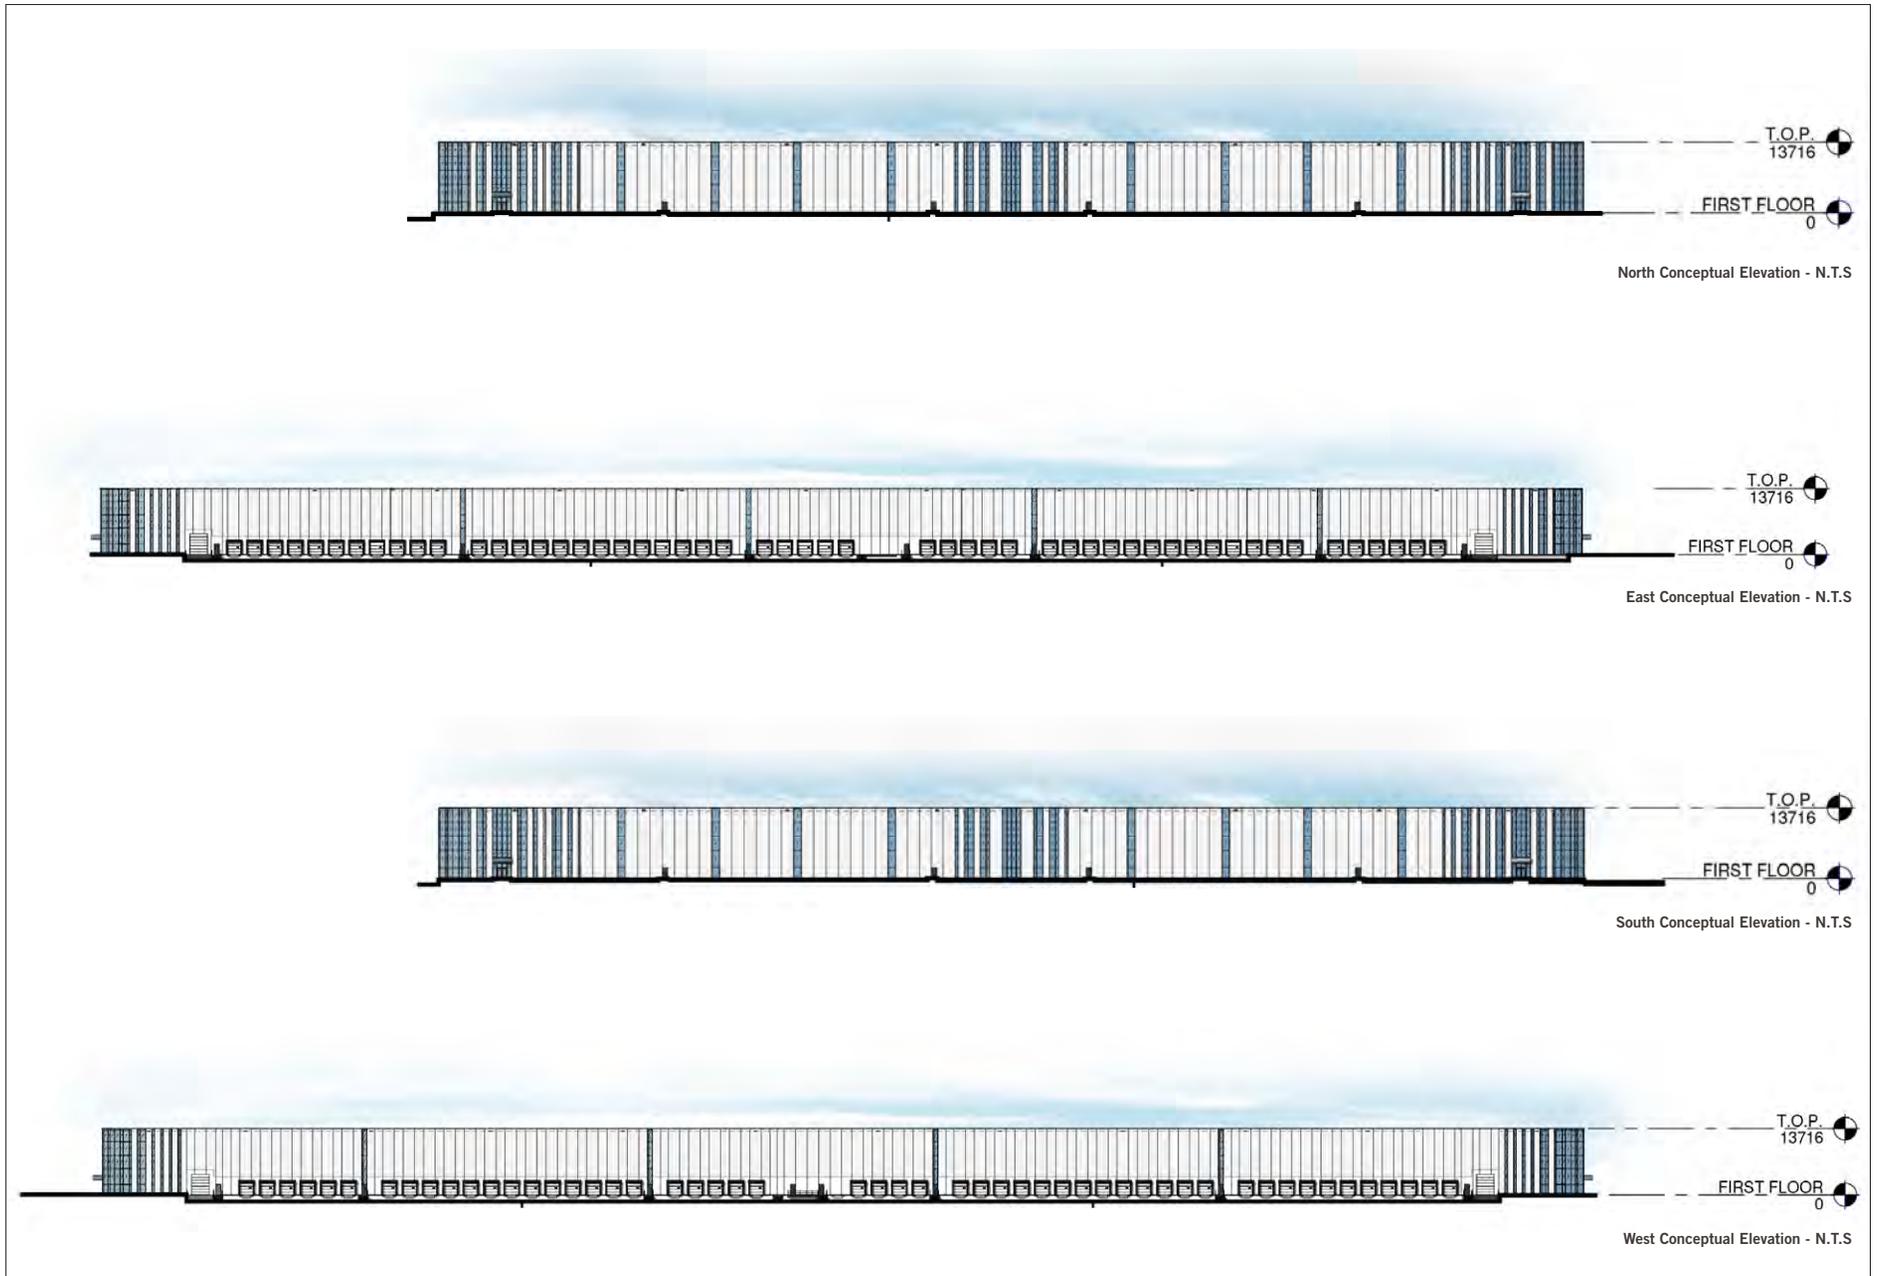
Proposed Building Conceptual Elevations – Building 2, prepared by Ware Malcomb
